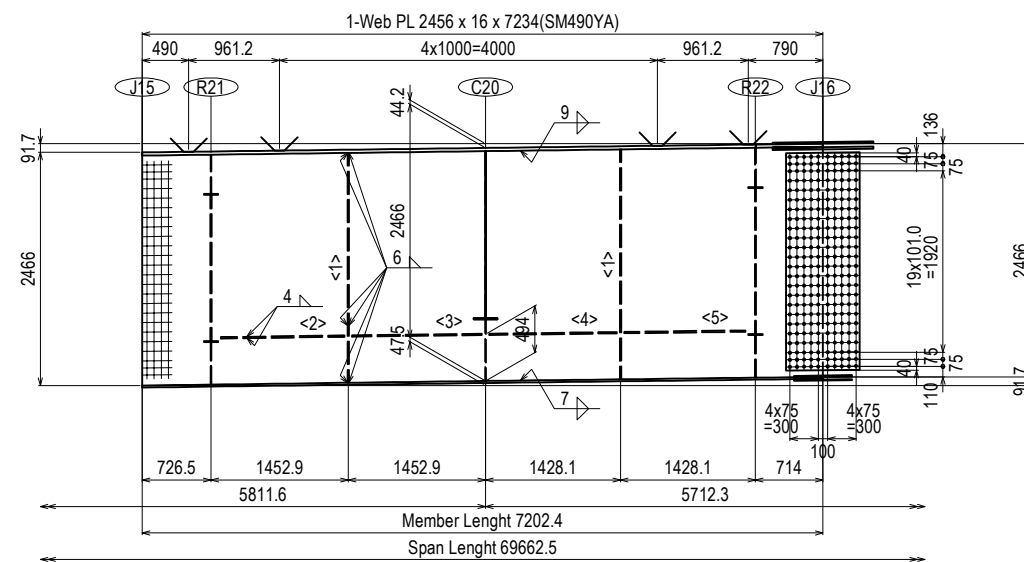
DETAIL OF MAIN GIRDER G1 (PF2-PF5) (16) S=1:80
